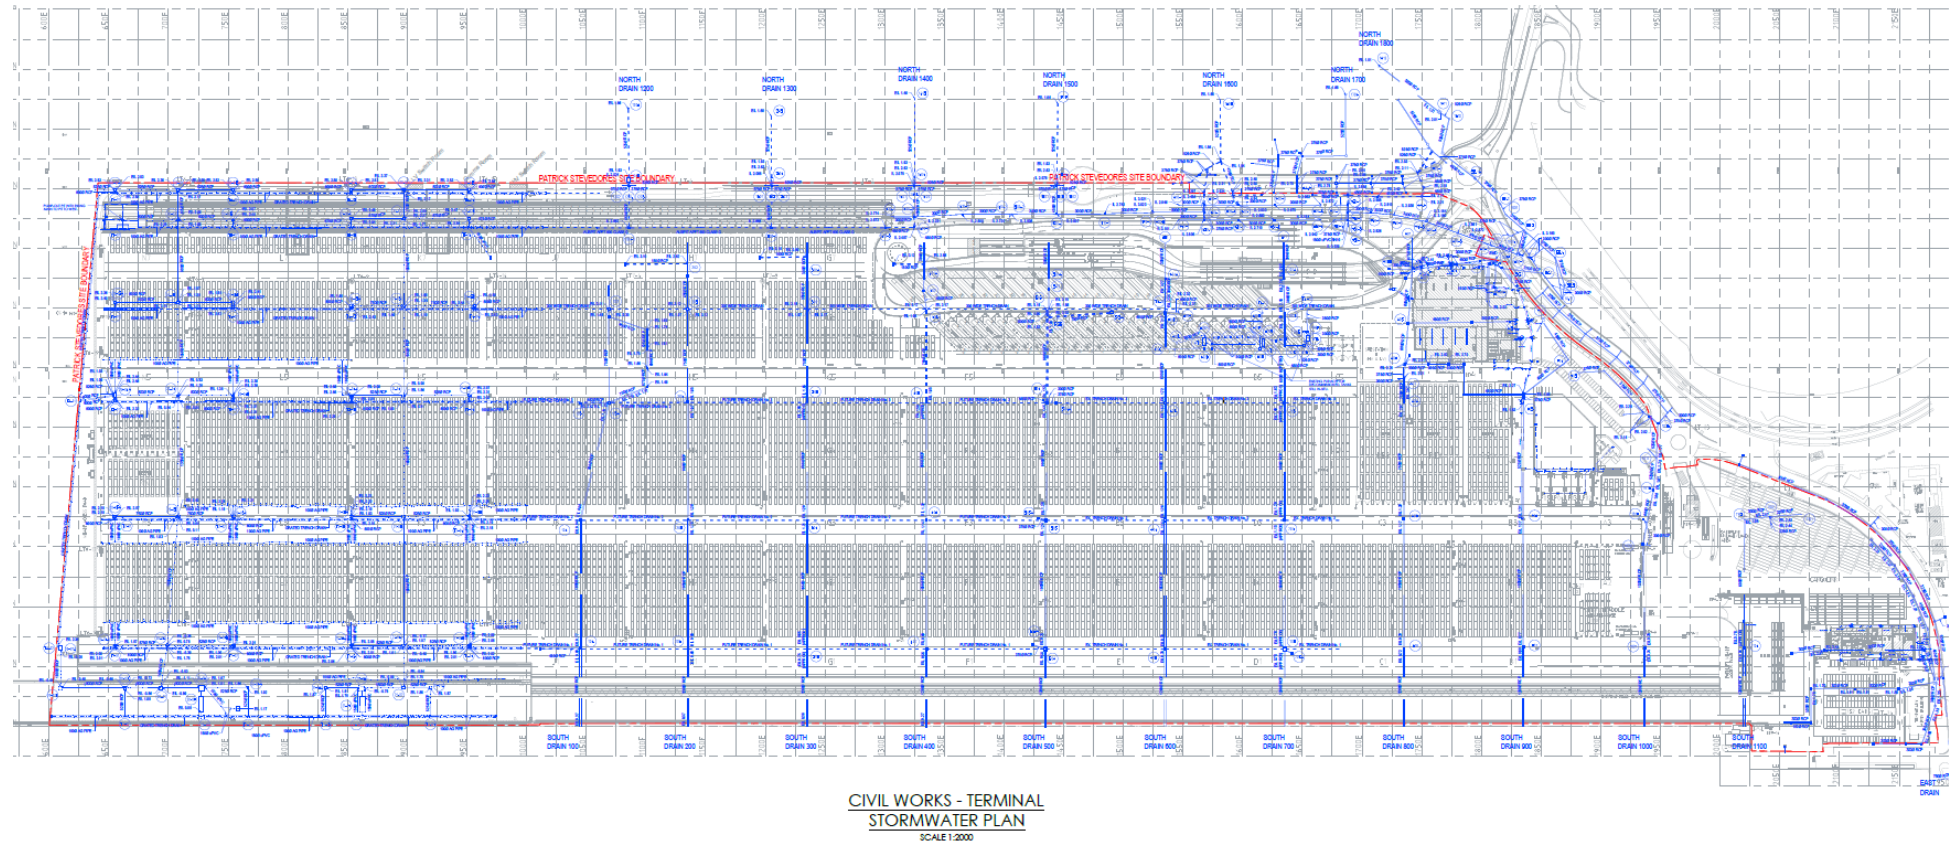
Patrick Terminal Stormwater Drainage System
